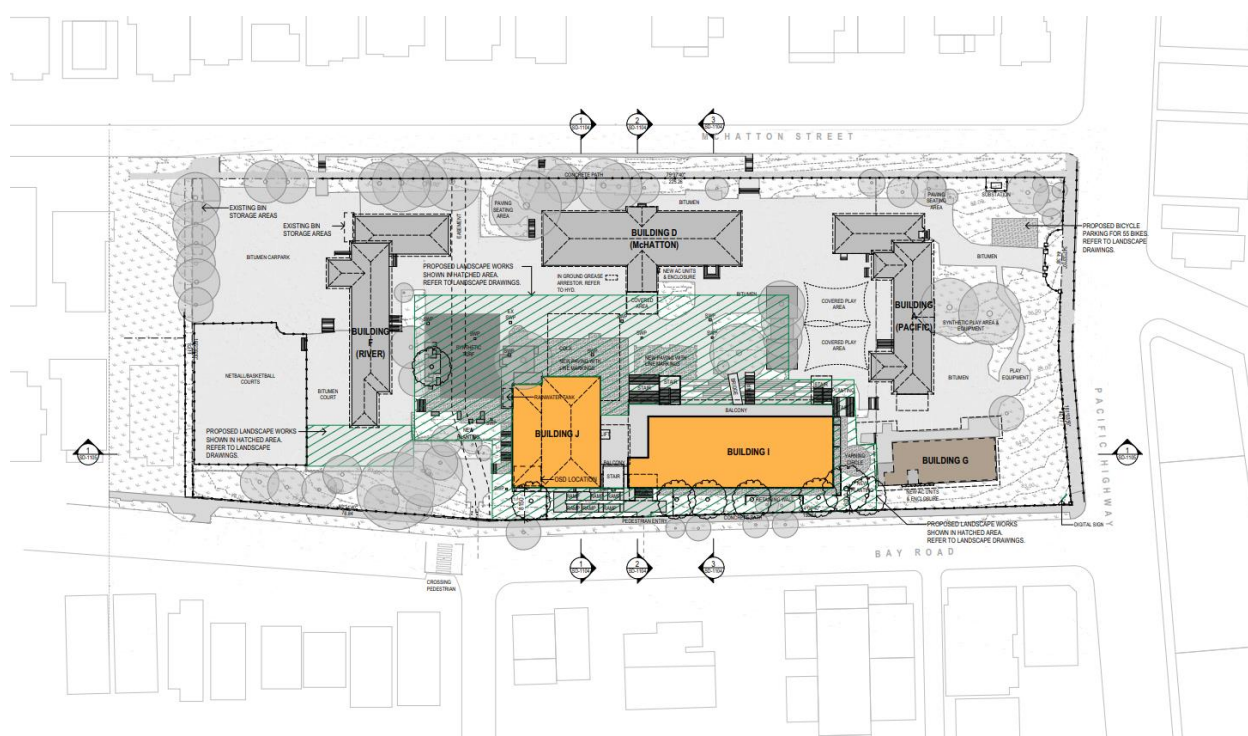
Approved site plan in SSD-11869481 (Source: Fulton Trotter)
